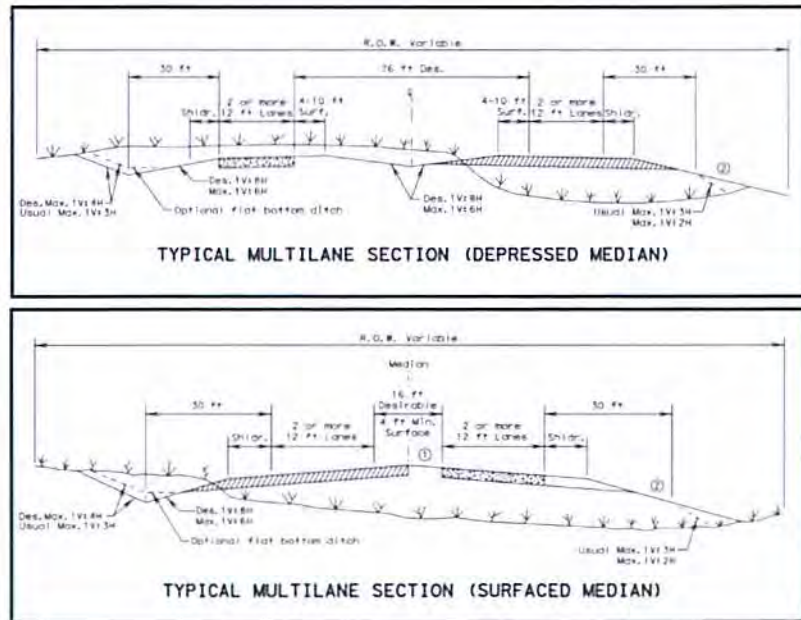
TYPICAL FREEWAY CROSS-SECTIONS
